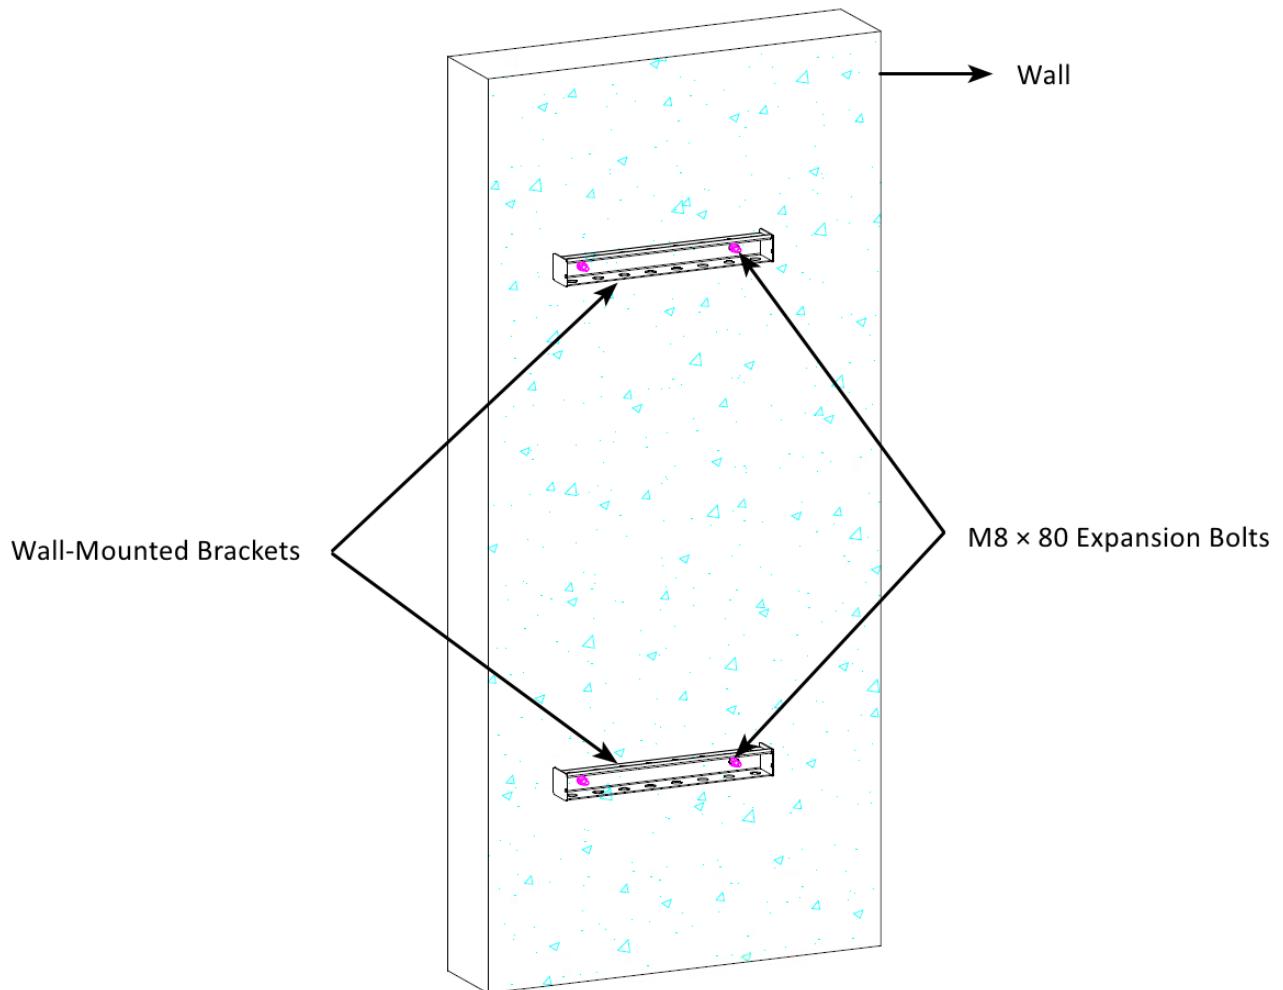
Install Wall-Mounted Brackets onto the Wall
